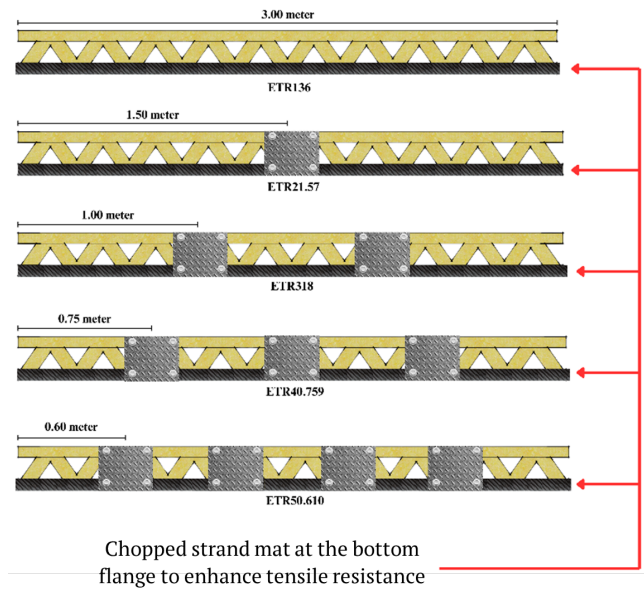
Modular timber beam reinforced with chopped strand mat applied at bottom flange.
